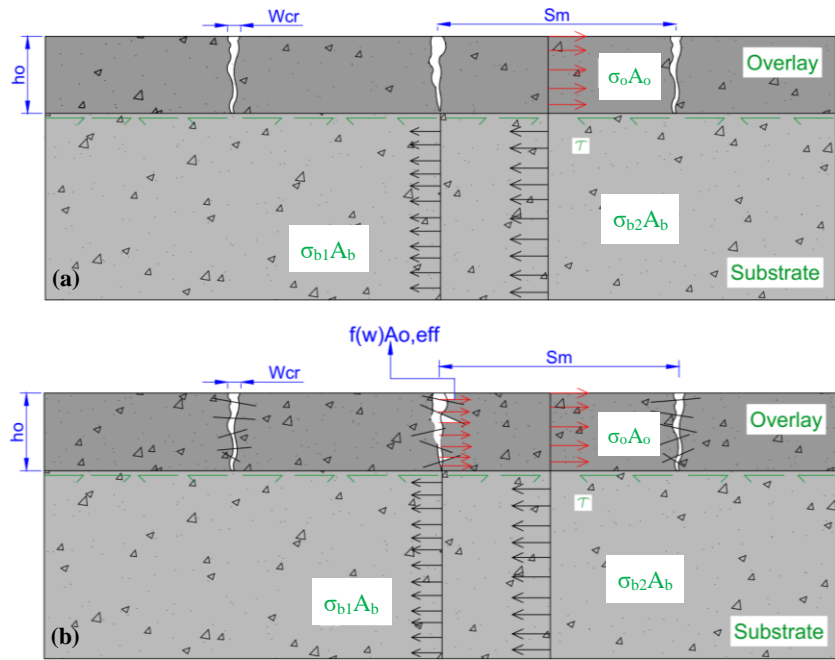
Concrete overlay system with multiple cracks: (a) Plain overlay; (b) FRSC overlay
